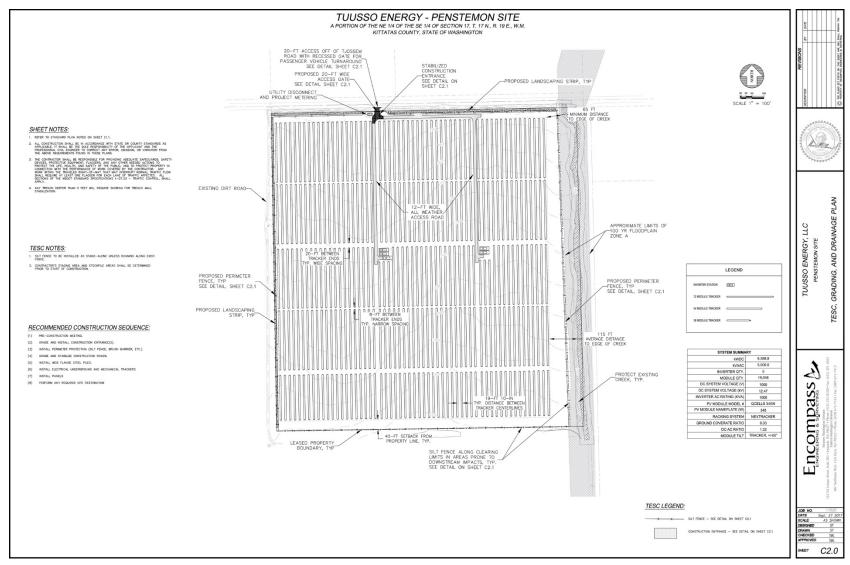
Penstemon Solar Project preliminary project plan.
